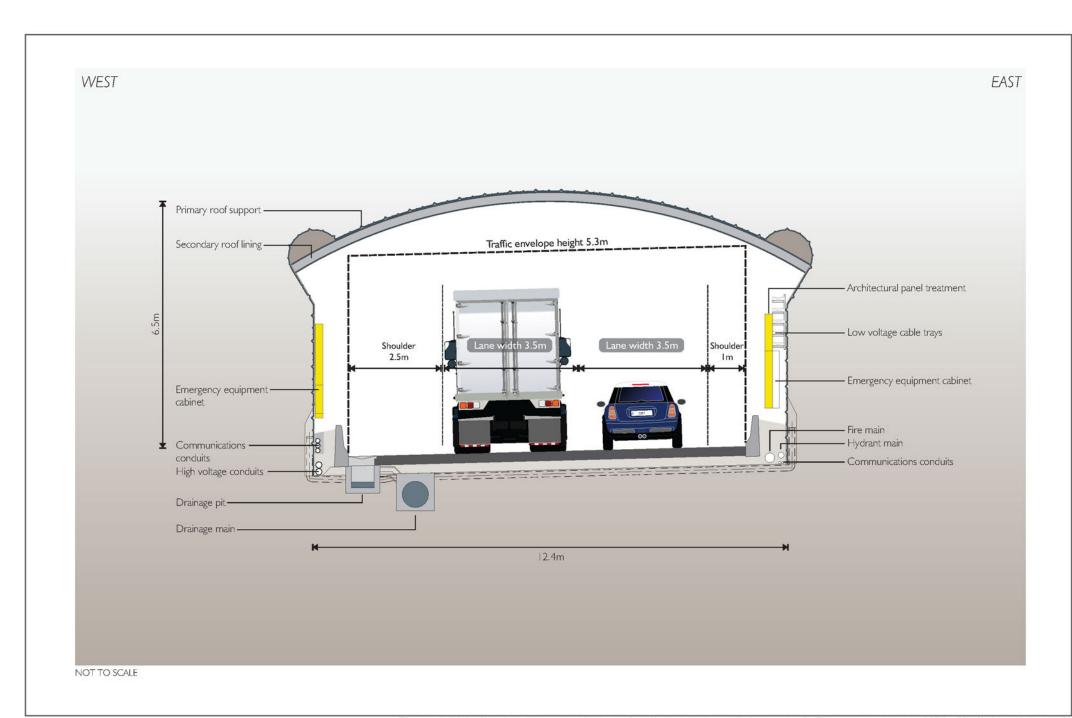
Indicative cross section - main alignment tunnels between St Peters caverns and M4 - M5 link stub tunnels
